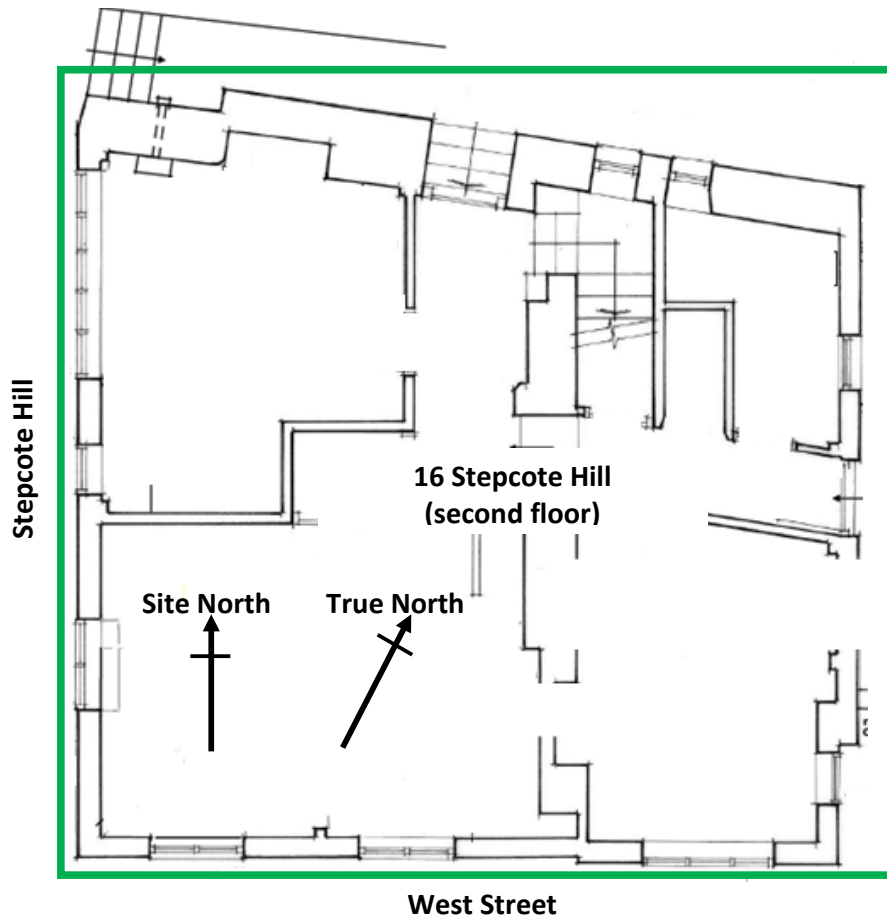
Plan of the West Street/Stepcote Hill site to show layout and arrangement of the building (after Simon Cartlidge | Architect 2016)
